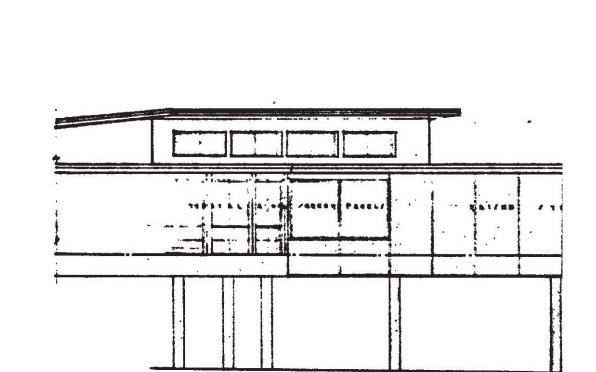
IMAGE W: ORIGINAL BLUEPRINT SOUTH ELEVATION (KECK. JR. ARCHITECT1956)
